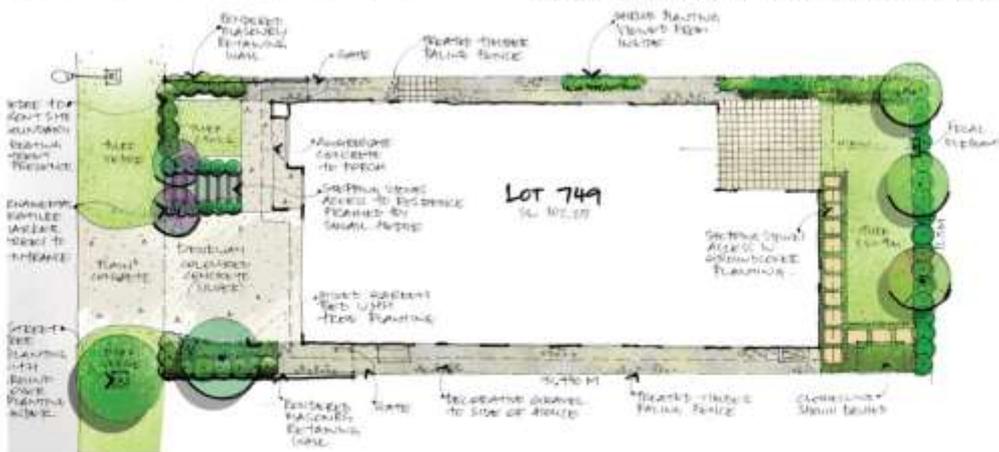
Landscape Plan at the Hermitage (source: Ground Ink Landscape Architects)
